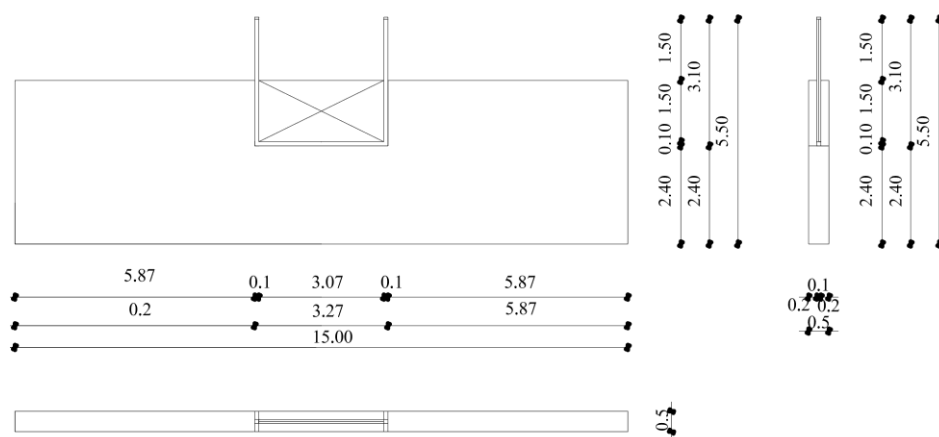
Detail of the concrete wall with a flow-regulating gate (drawing by author).
